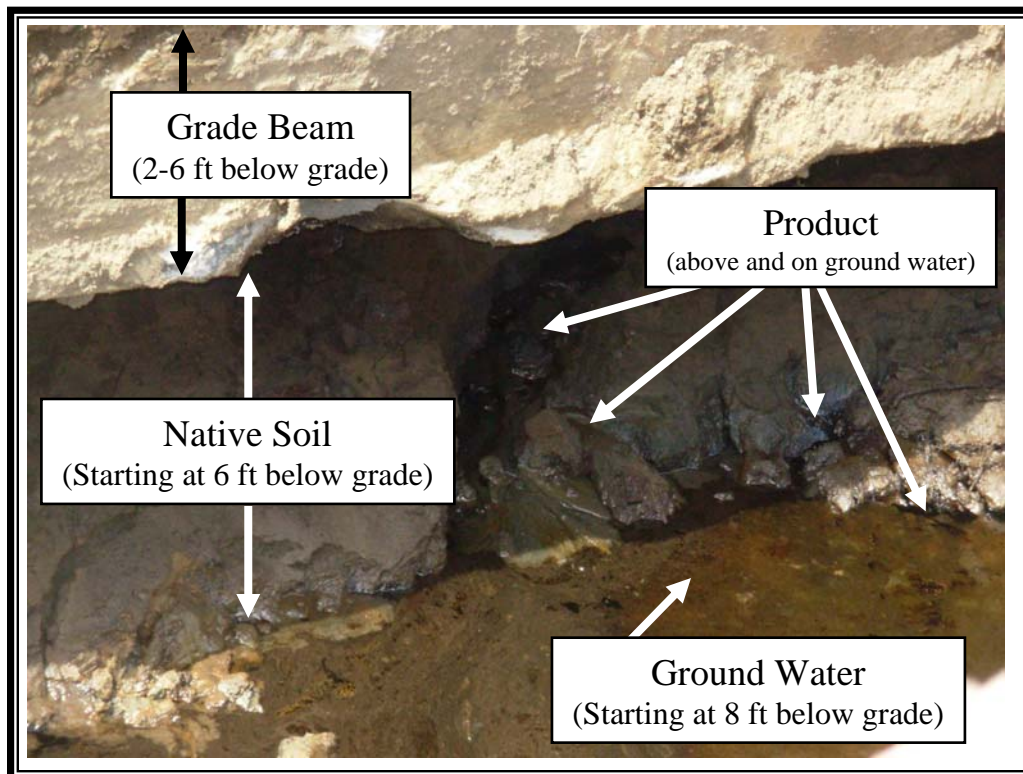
View of western wall of test pit TP-5, showing free-phase petroleum below grade beam.
